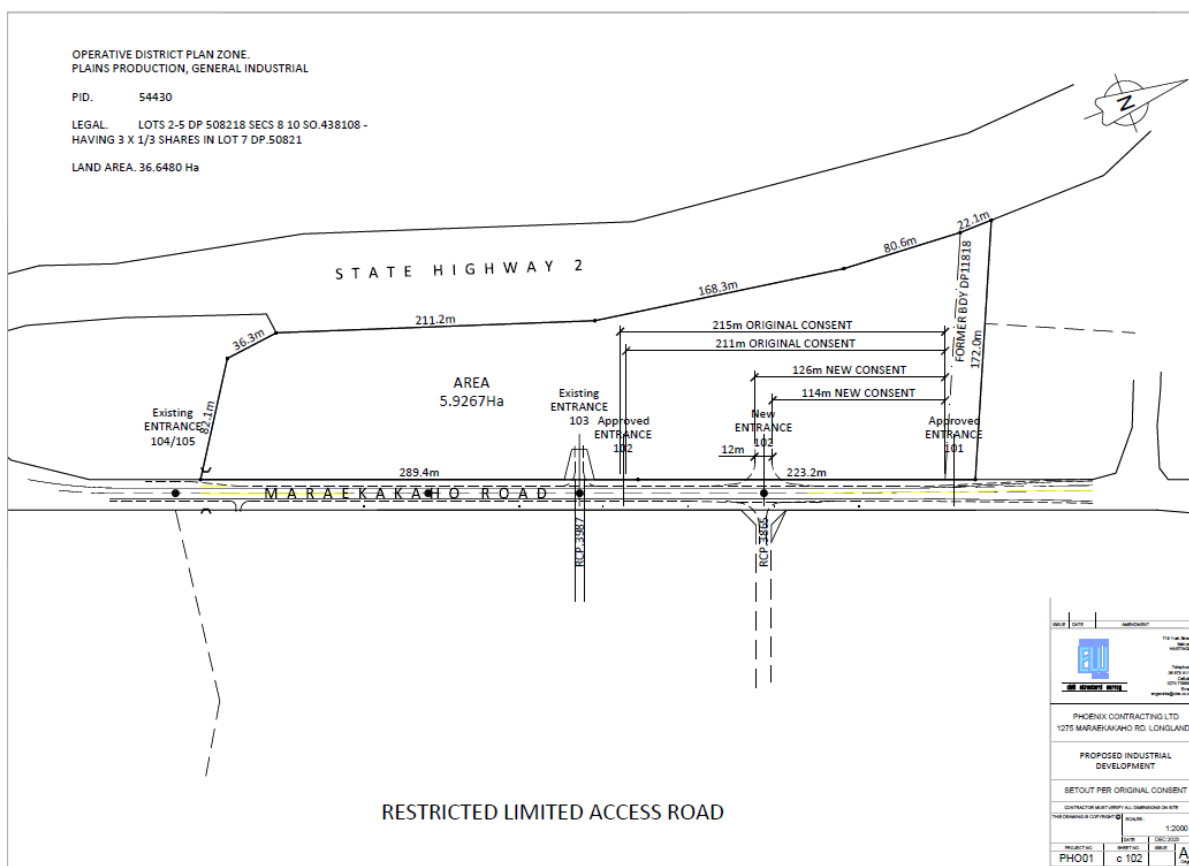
Location of Crossing Places CP 102 and CP 103 at 1275 Maraekakaho Road
